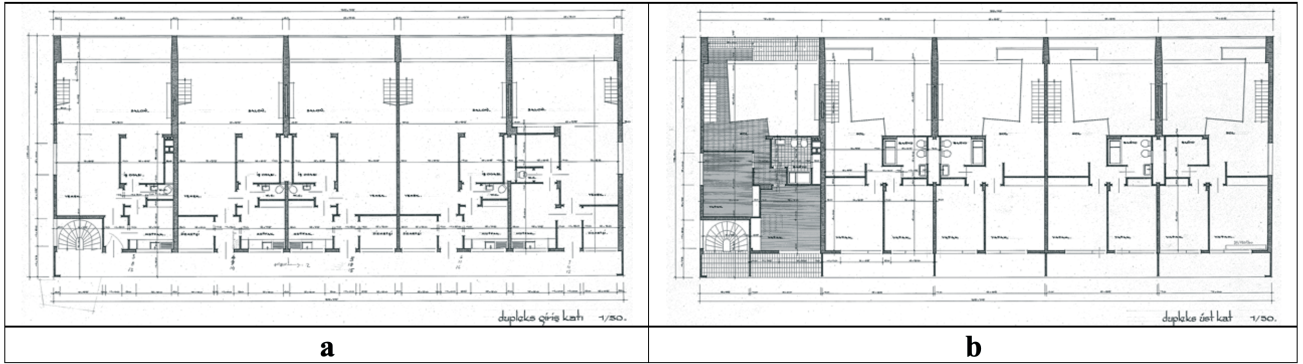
The third proposal prepared by Architect Nejat Ersin. a. Residential unit's entrance floor plan. b. Residential unit's mezzanine floor plan (Archive of Ankara Metropolitan Municipality).
